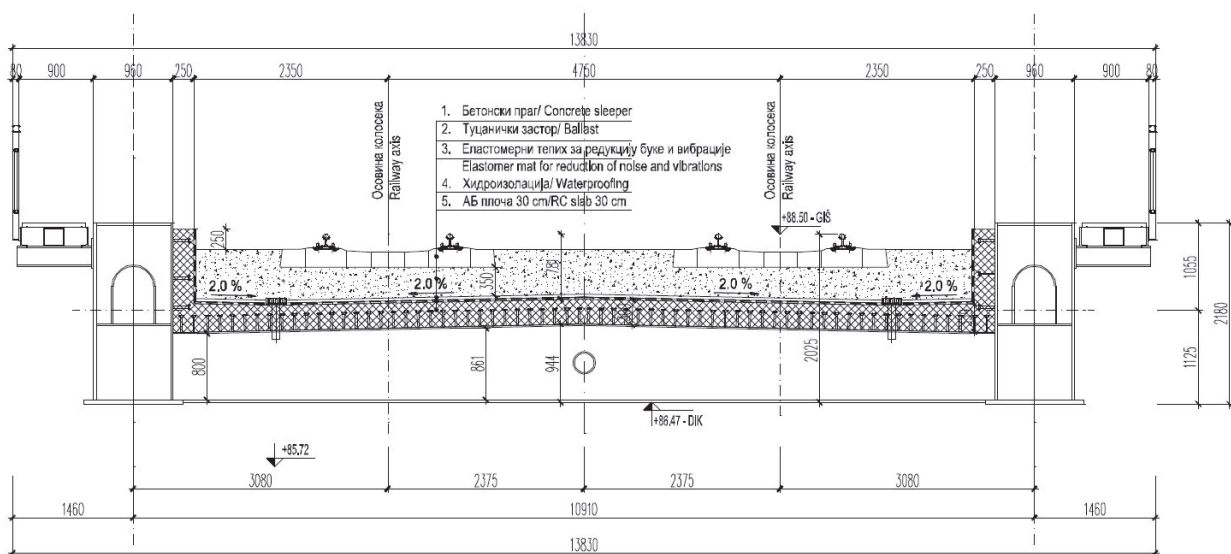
Bridge at km 0+796 – Typical cross section in spans 1 and 3
